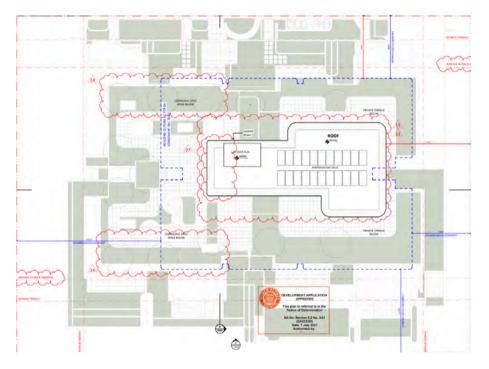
DA232/2020 – section 8.2 review approved roof plan with one unit on level 3
